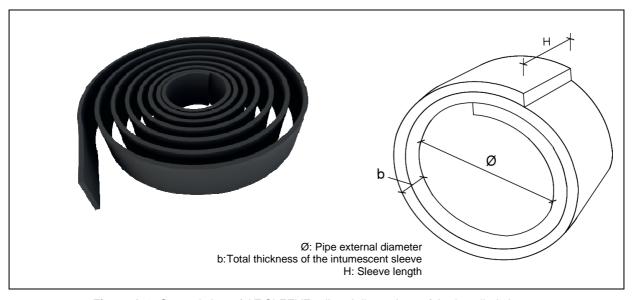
General view of AF SLEEVE roll and dimensions of the installed sleeve.
